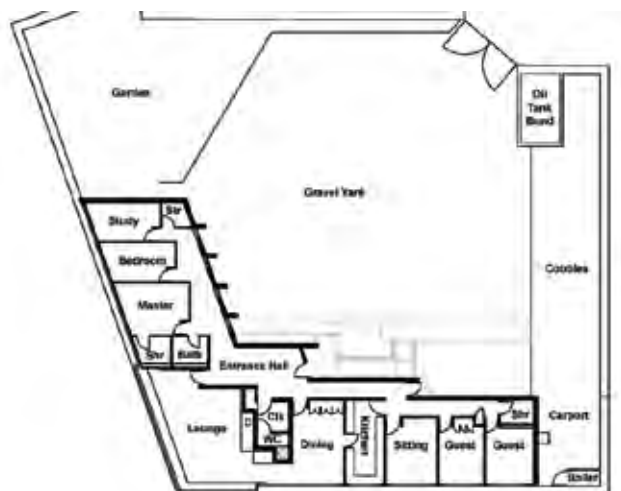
Plan of the Principal's House as existing 2009 UoSA
